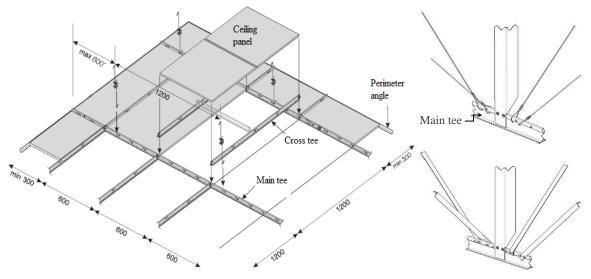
a) (Left) Typical suspended ceiling components by Armstrong (2013); b) (Right) Typical back bracing options by USG (2012)
